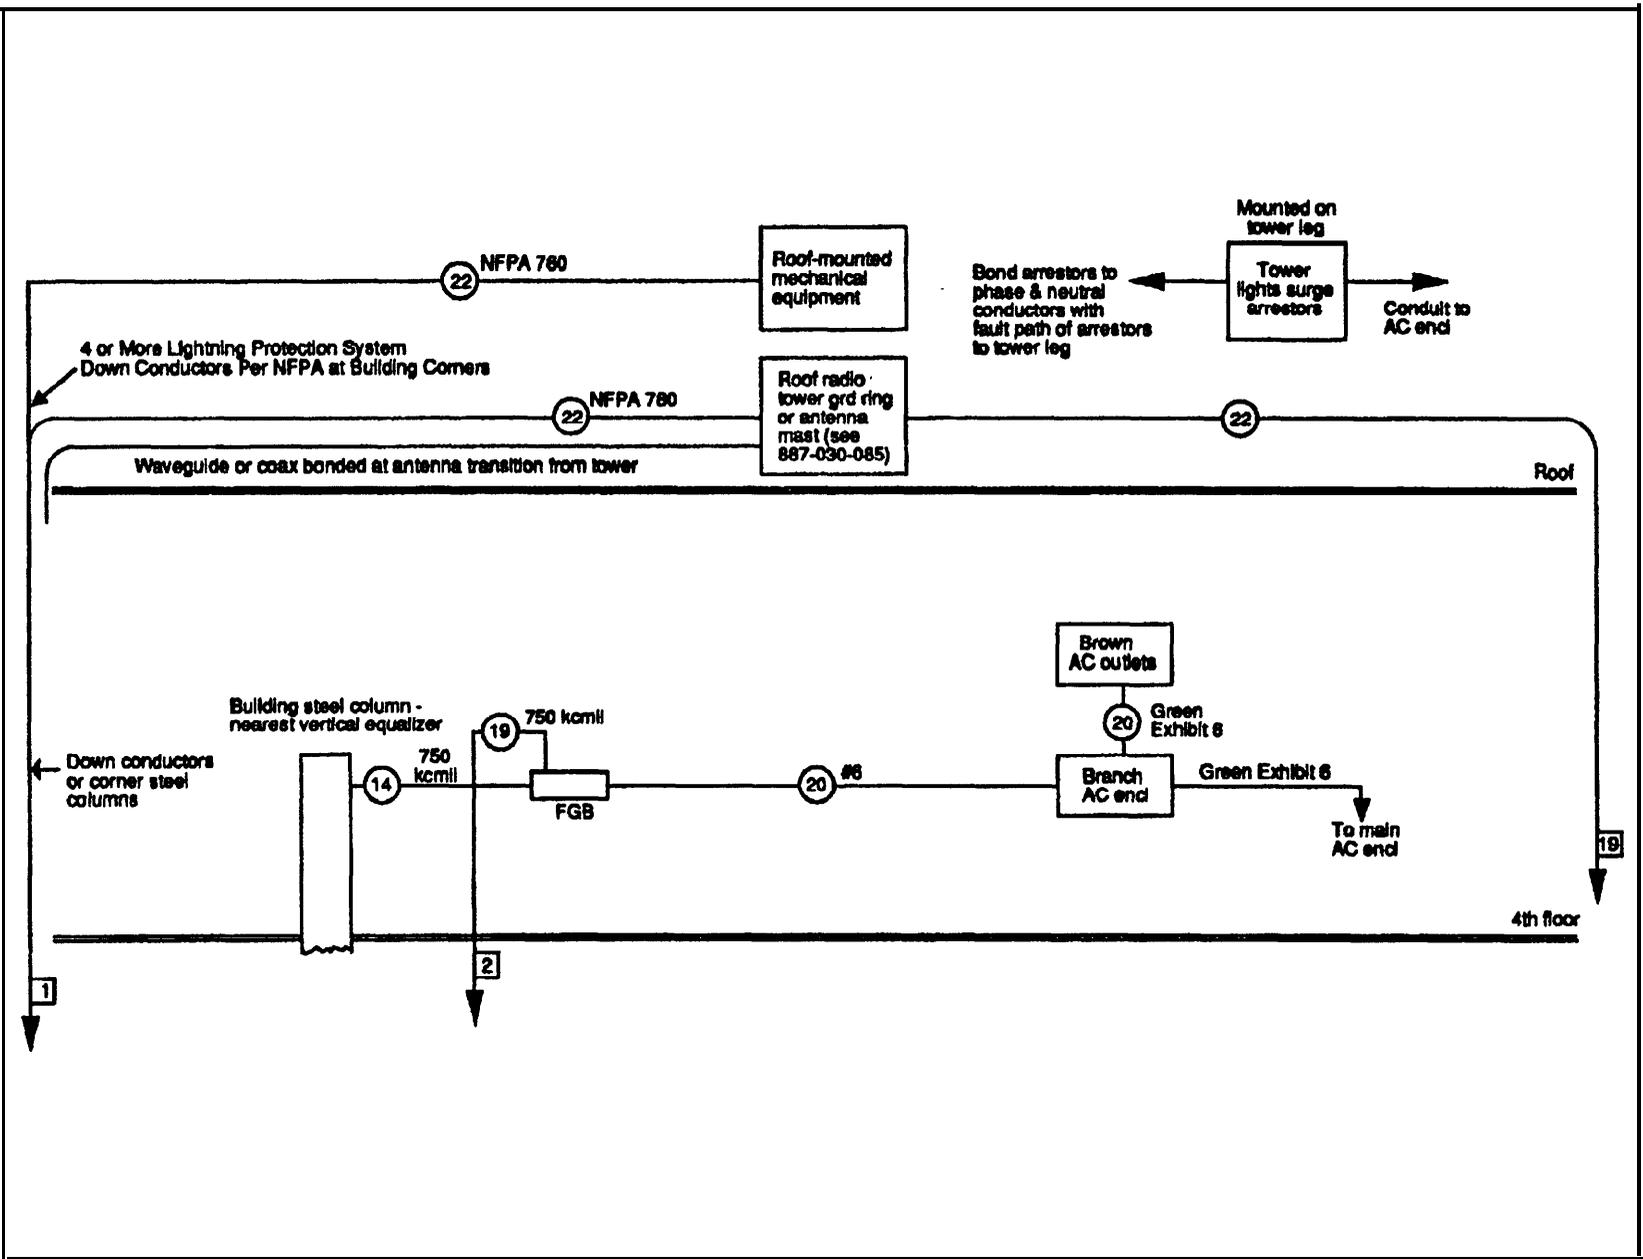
Central Office Grounding System, Fourth Floor and Roof
